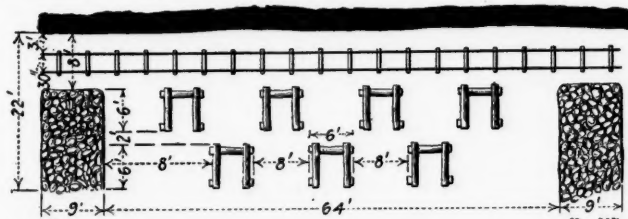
SHOWING ARRANGEMENT OF CHOCKS AND FACE TRACK IN LONGWALL WORK
